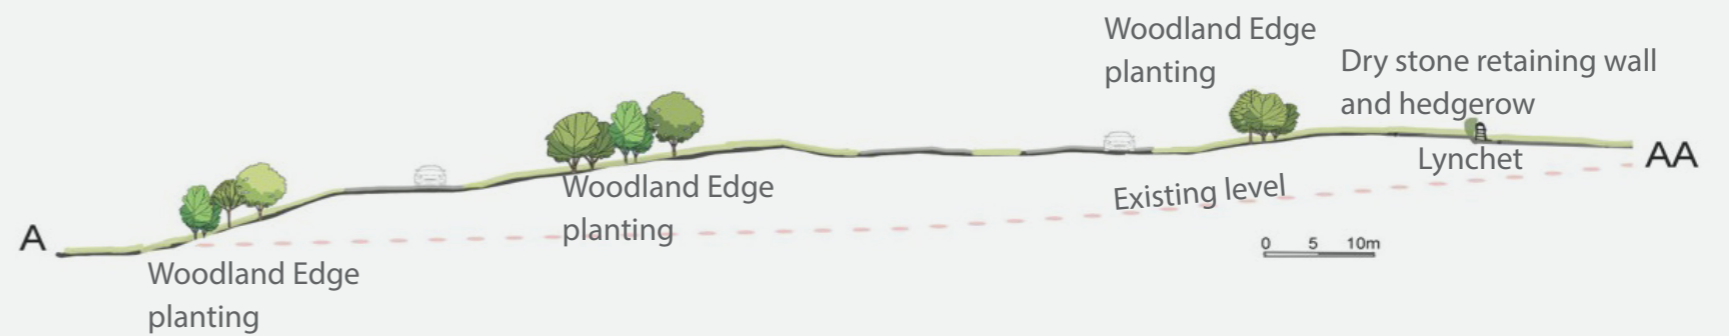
Sketch section showing integration of the road with earthworks and planting
